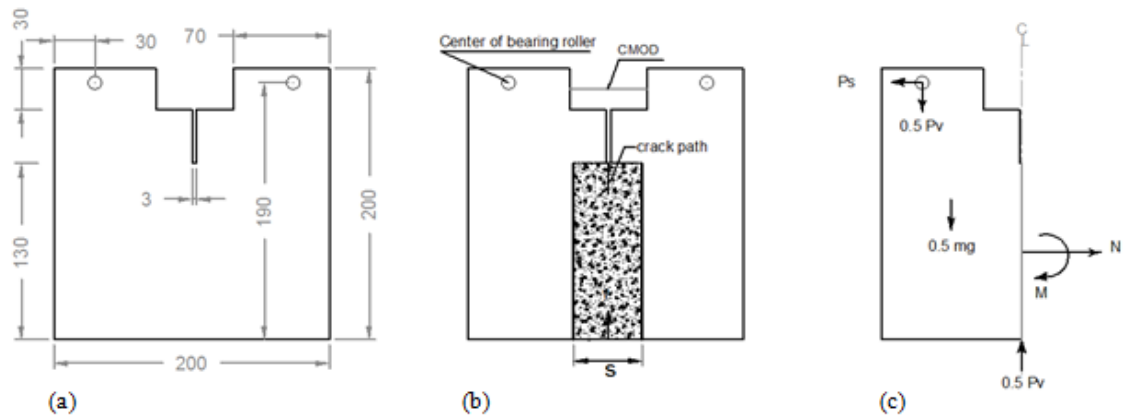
(a) Geometry of the WST-specimen, (b) Incorporation of the hinge model, (c) loading (CMOD: crack mouth opening displacement, P_v : vertical load, P_s : splitting load, mg : specimen weight) (All dimensions are in millimetres)
